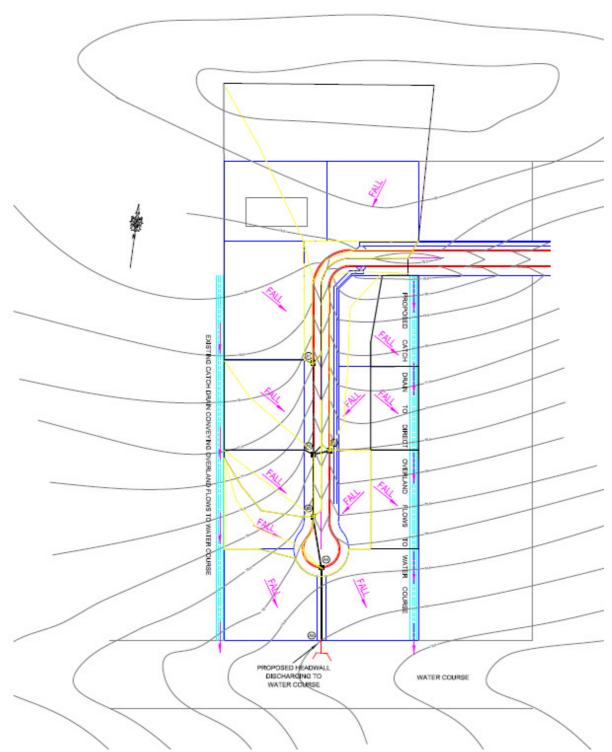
Stormwater drainage system example to serve a 10 lot residential subdivision
